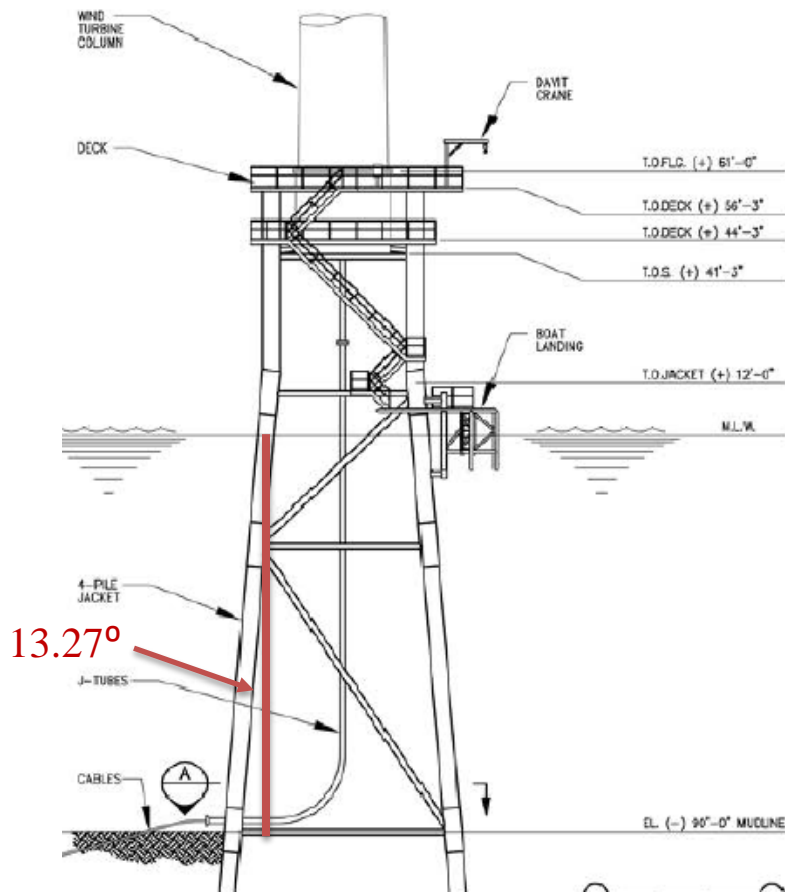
Schematic of the lattice jacket foundation structure showing the raked piles.
